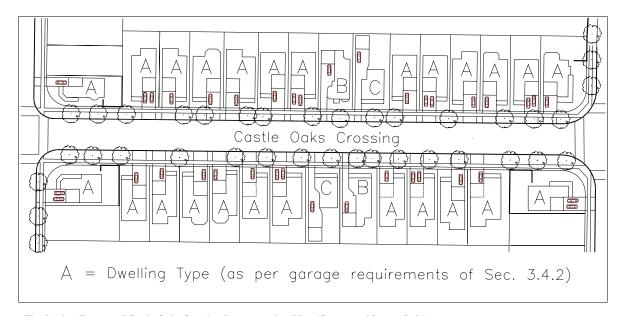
Excerpt of Castle Oaks Crossing Demonstration Plan (Conceptual Image Only)
